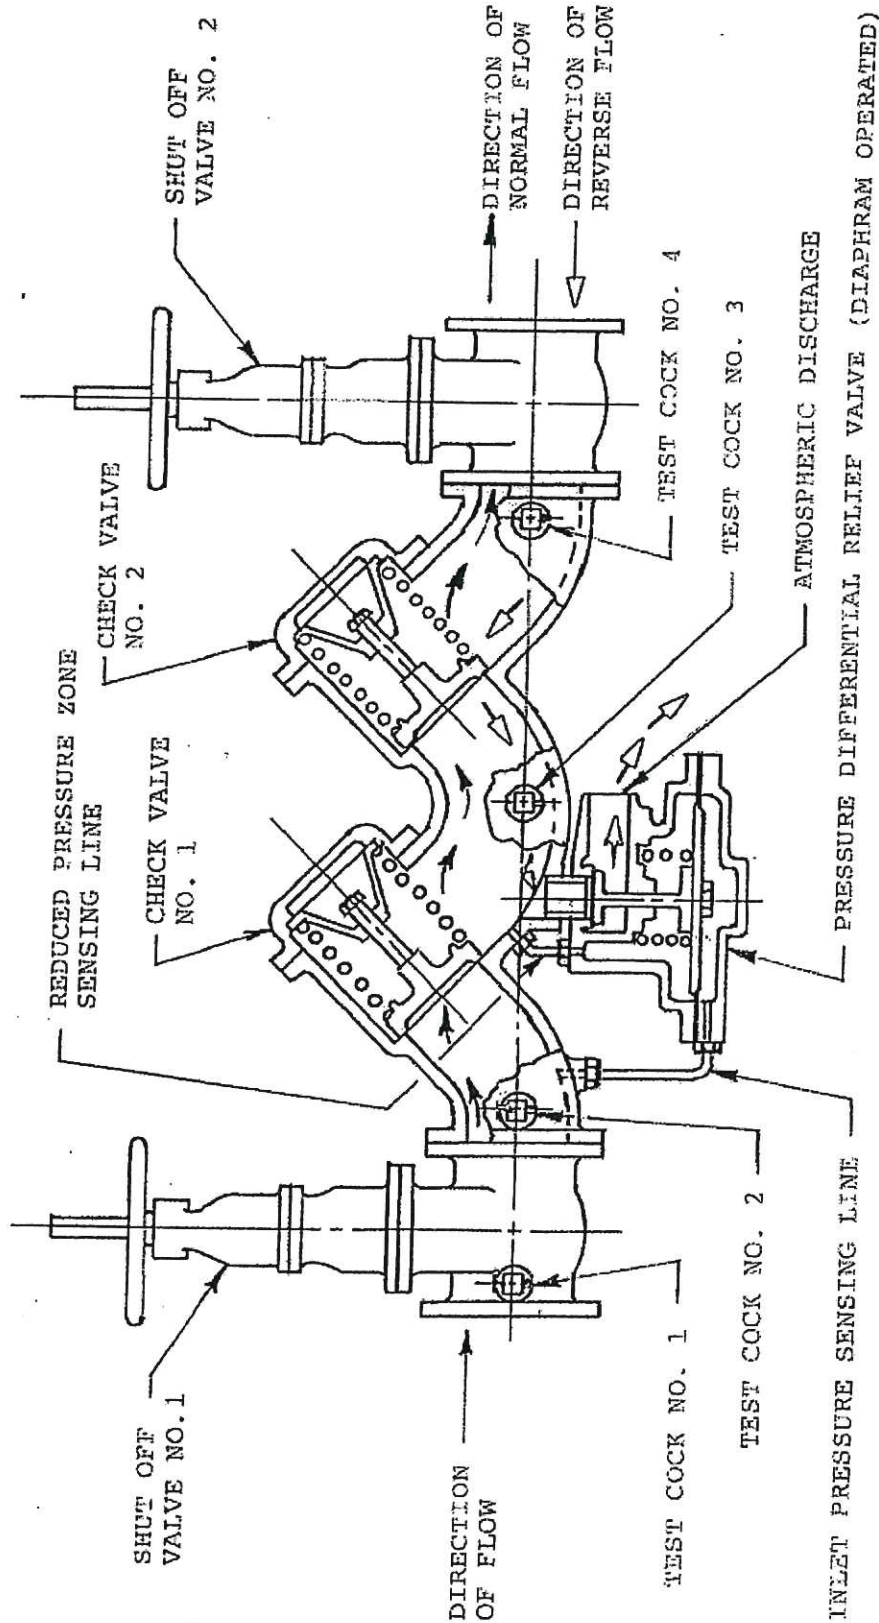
Reduced Pressure Principle Backflow Prevention Assembly
